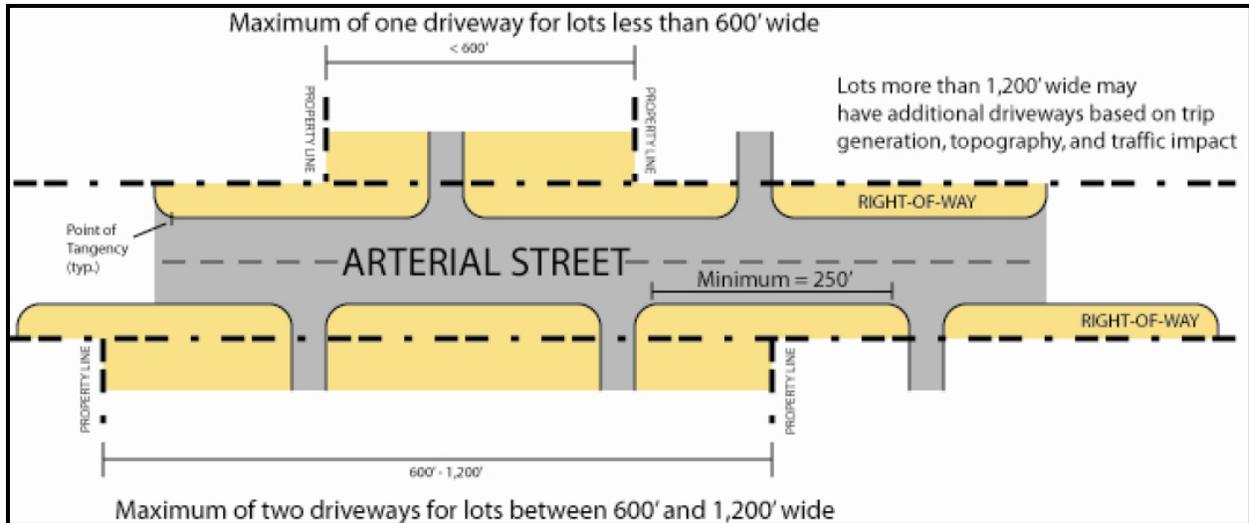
(8) – Arterial Street Driveway Spacing Criteria
